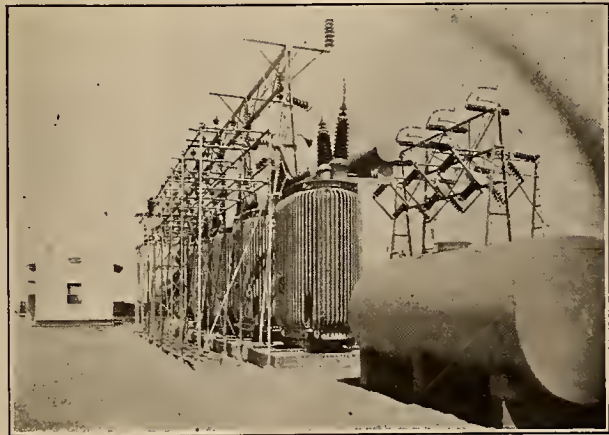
Auto-transformers, transformer bus, oil-storage tank, and substation building, Le Grand substation.
